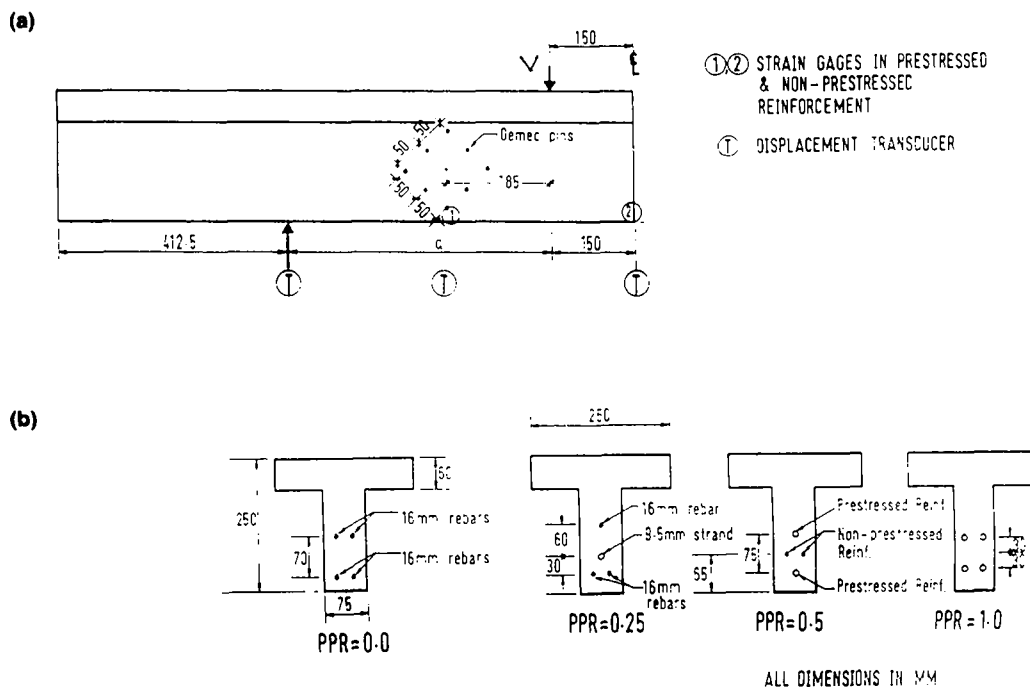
(a) Test set-up and loading arrangement. (b) Details of the beam section at A-A.
